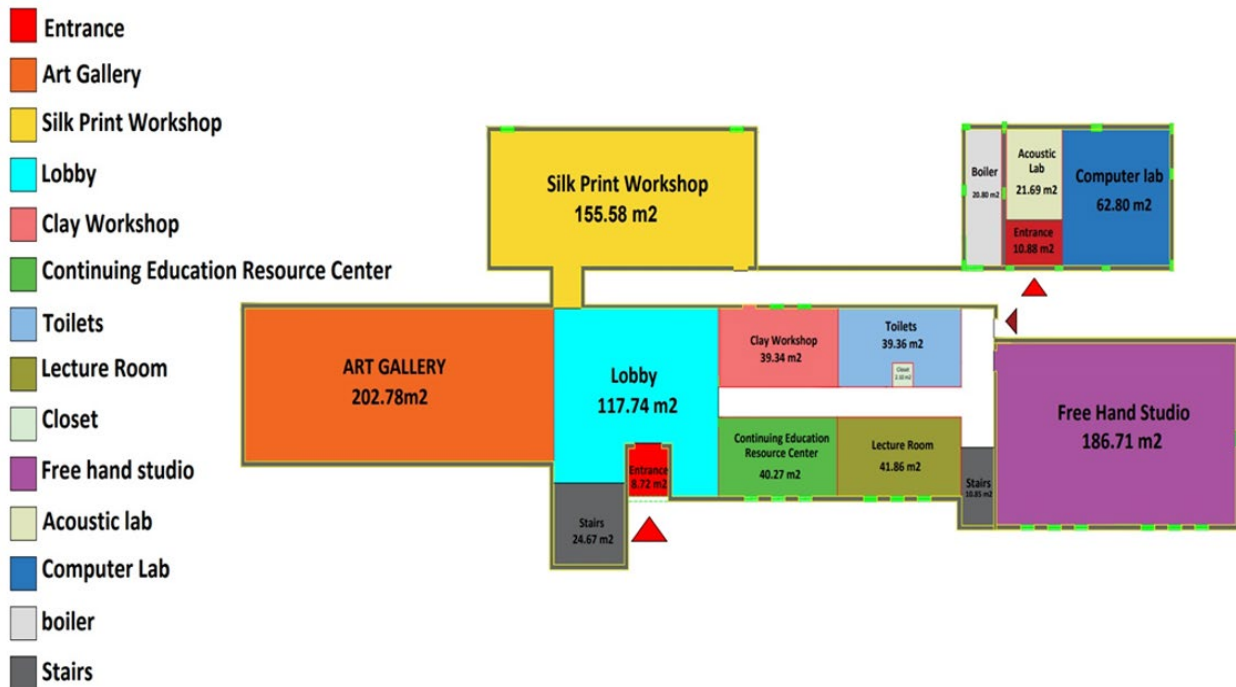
Indicates the zoning plan of the faculty's ground floor
